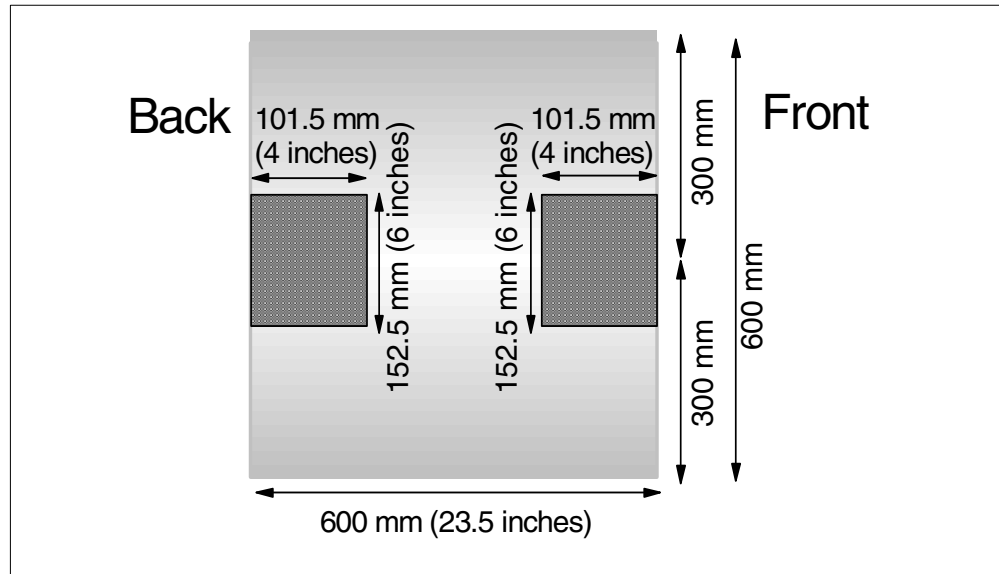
IBM 2029 recommended floor tile cutout dimensions per frame
